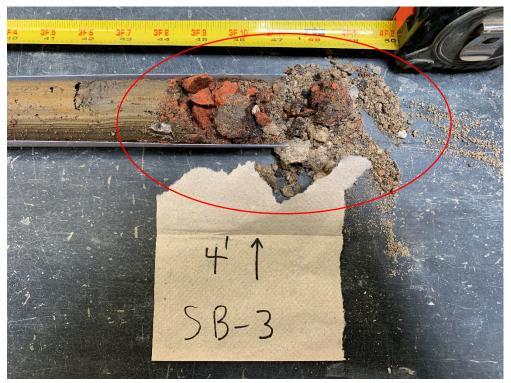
Brick, concrete and coal fragments in fill at boring SB-3
